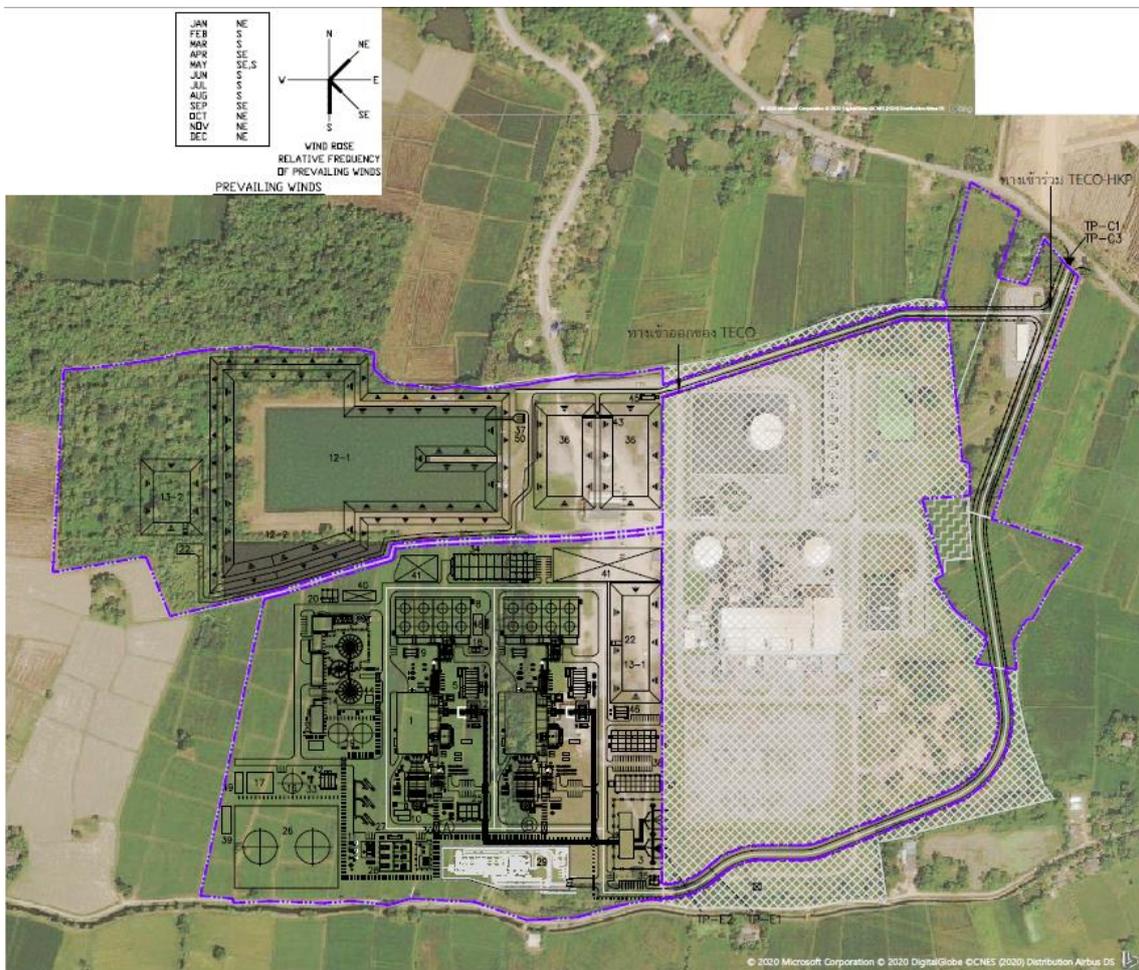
Landmark location of the house area behind the power plant
